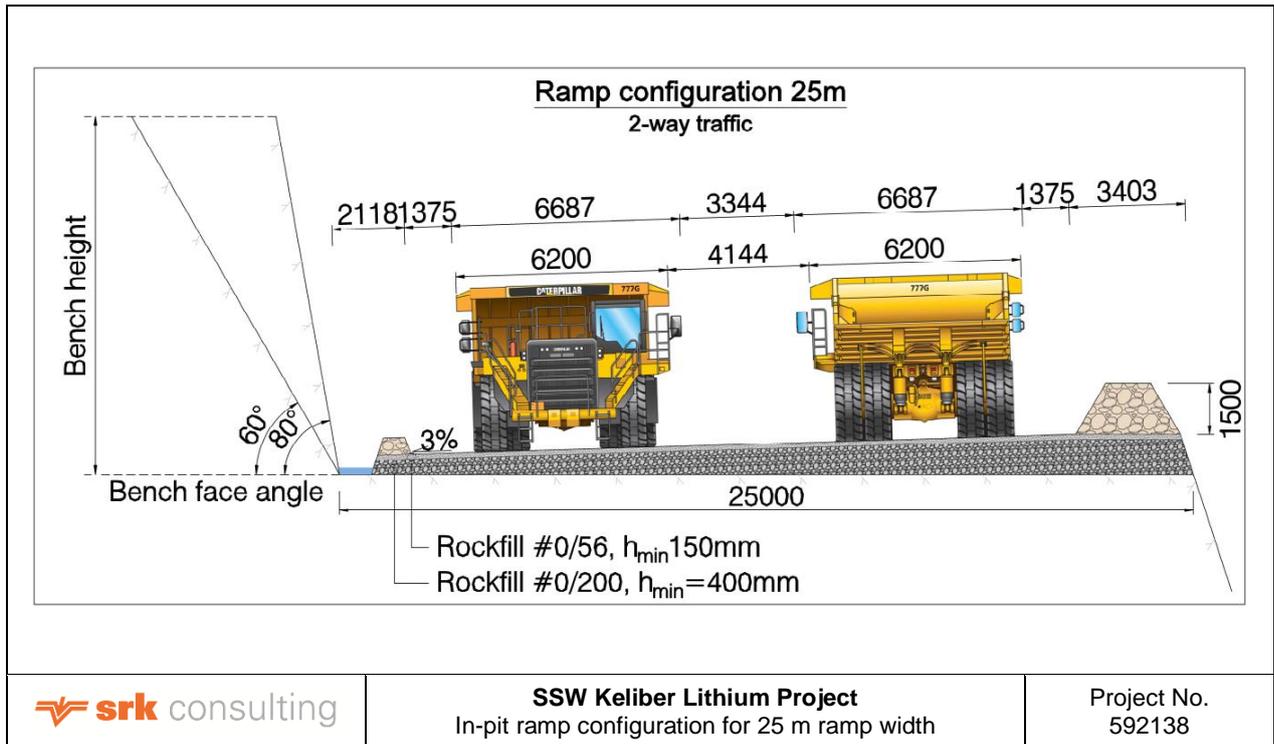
In-pit ramp configuration for 25 m ramp width
